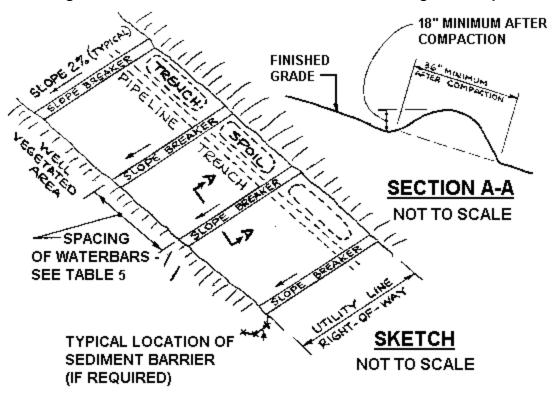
Waterbar Installation on a Backfilled Right-of-Way
